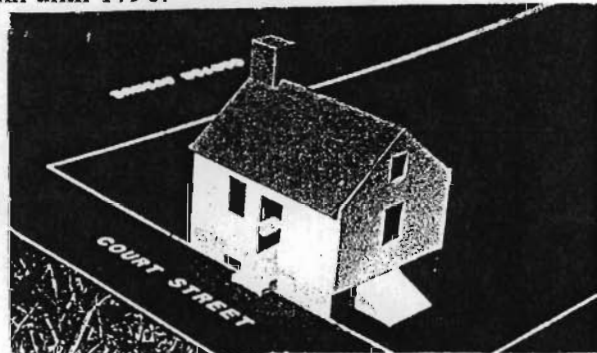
Period A (c. 1730), the first building at the Court Inn site. It was located along Court Street about 30 feet from the corner of Court Street and Centre Avenue. Of frame construction except for a large stone fireplace in the north wall, it is represented today by the Reception Room of the Court Inn.
